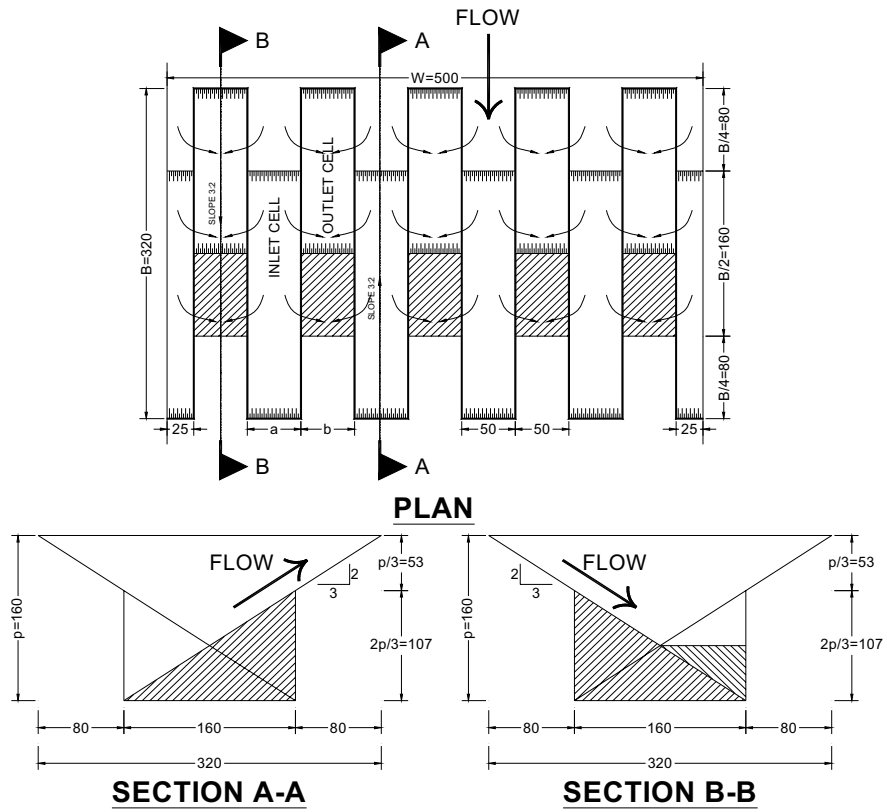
Plan and section of model P₂M₂ with filling outlet cell modification (dimensions in mm)
